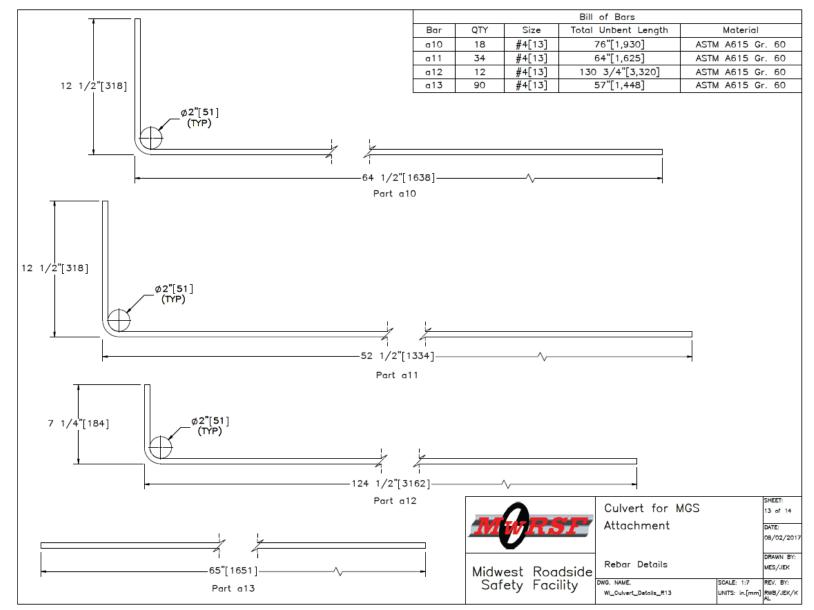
Rebar Details (Cont.), Test Nos. CMGS-1 and CMGS-2
